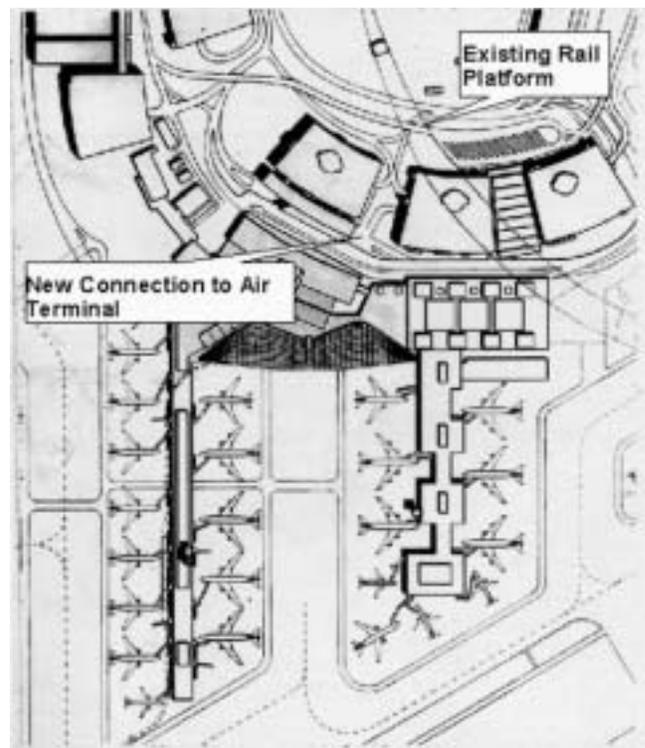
A new connection to the air terminal complex will be built in Zurich.
